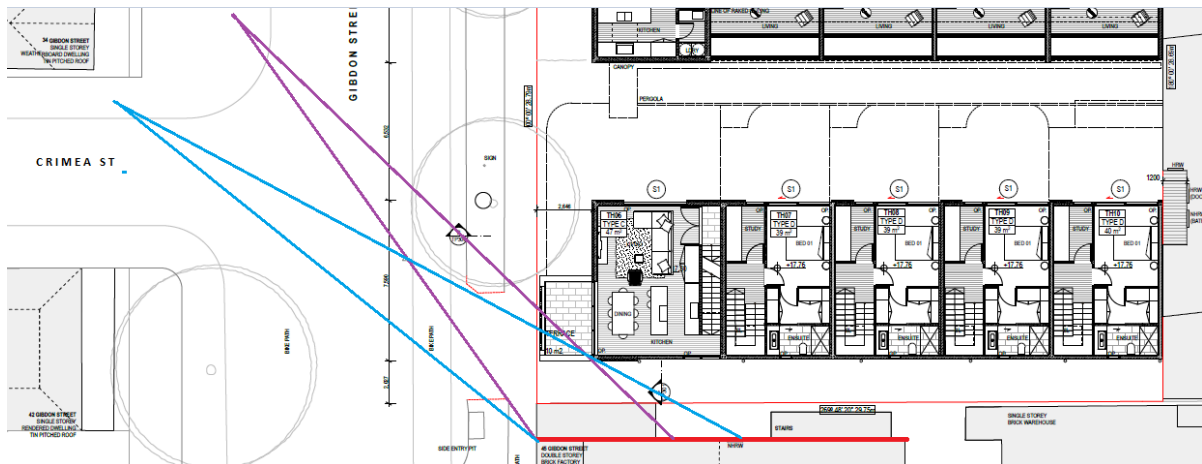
View lines (purple and blue) to the northern brewery façade of No. 45 Gibdon Street (red) (Applicant submission, December 2021).
